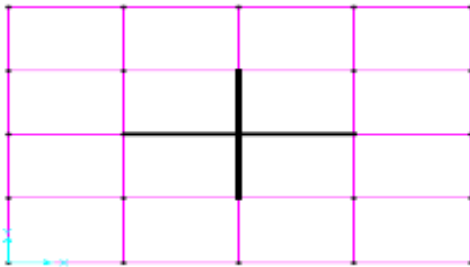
MR TYPE 3 (Model of Building with Shear Wall type3 at centre)
